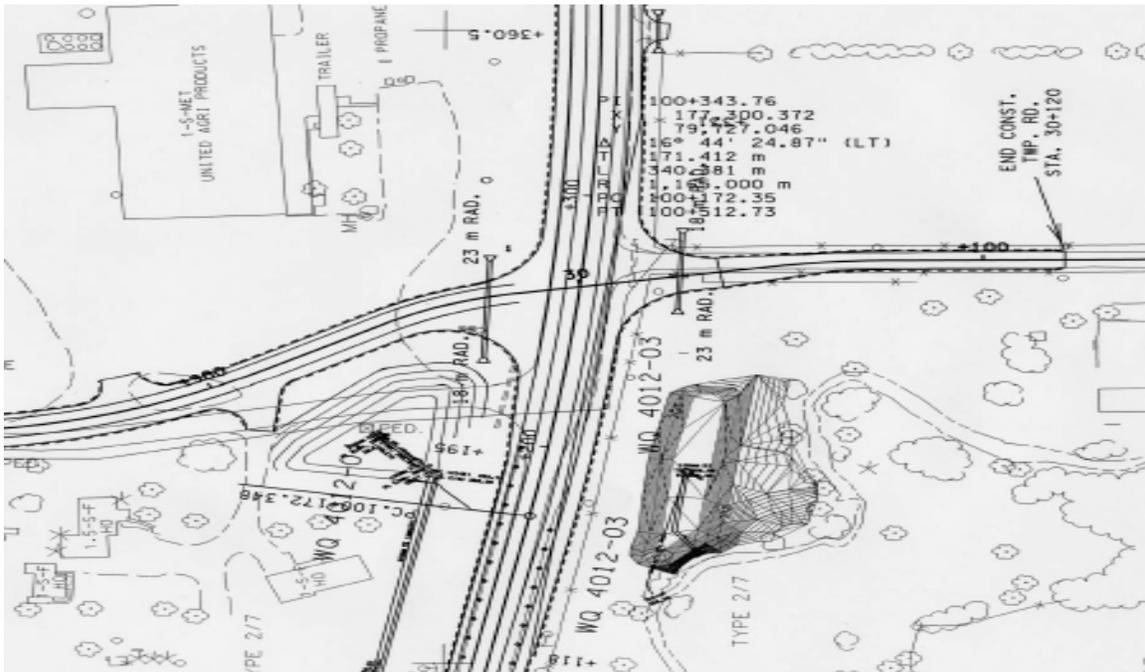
Plan view of Mn/DOT pond 4012-03 and Mn/DOT pond 4012-04
